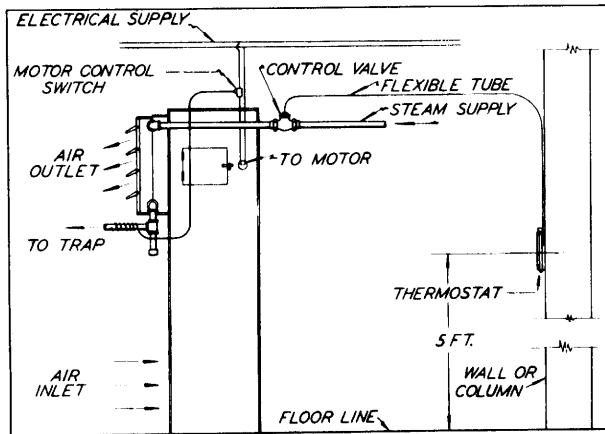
A No. RT-207 Regulator controlling low pressure steam supply to a floor type heater. Thermostatic switch is shown for stopping motor when steam supply is cut off by regulator or by main steam valve. Motor automatically starts when steam is turned on.
